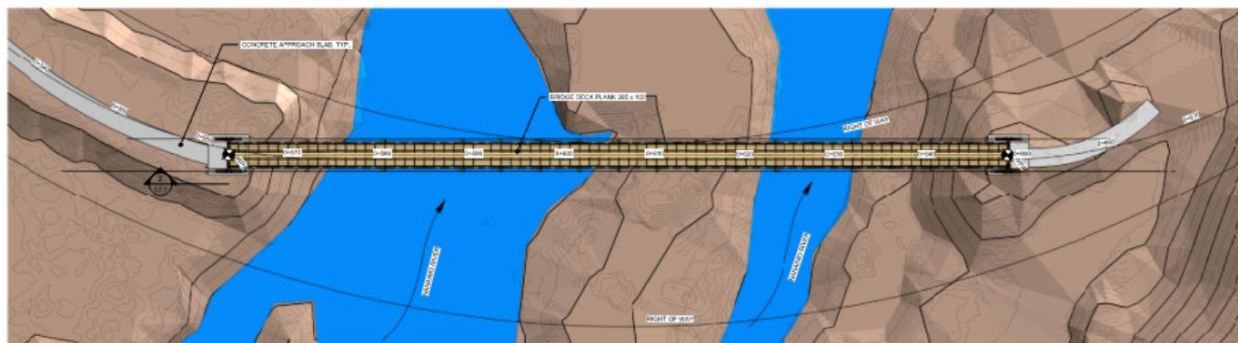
Plan view of the cable-supported concept showing the bridge plan layout within the narrow right-of-way and anchorage constraints for the curved right-of-way for the East Channel Bridge.
